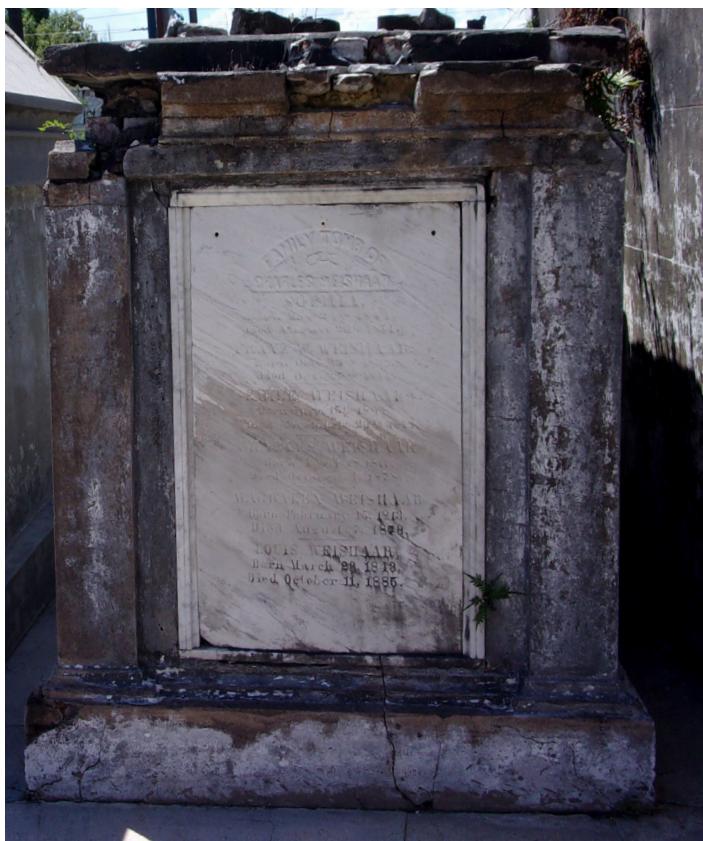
Significant missing material of the cornice and roof, cracking, spalling, and staining of front facade.
